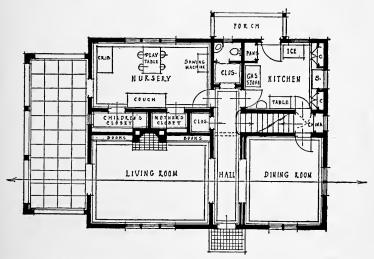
The first floor plan of a suburban house designed for the accommodation of a family with little children.
